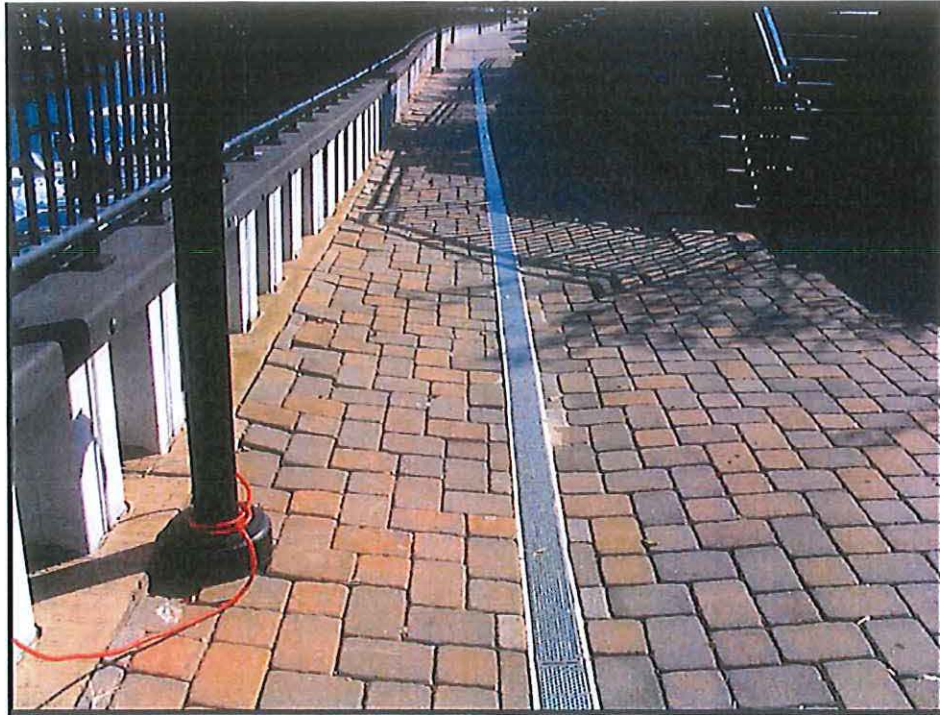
Settlement along the storm drain at the top of the bulkhead.
